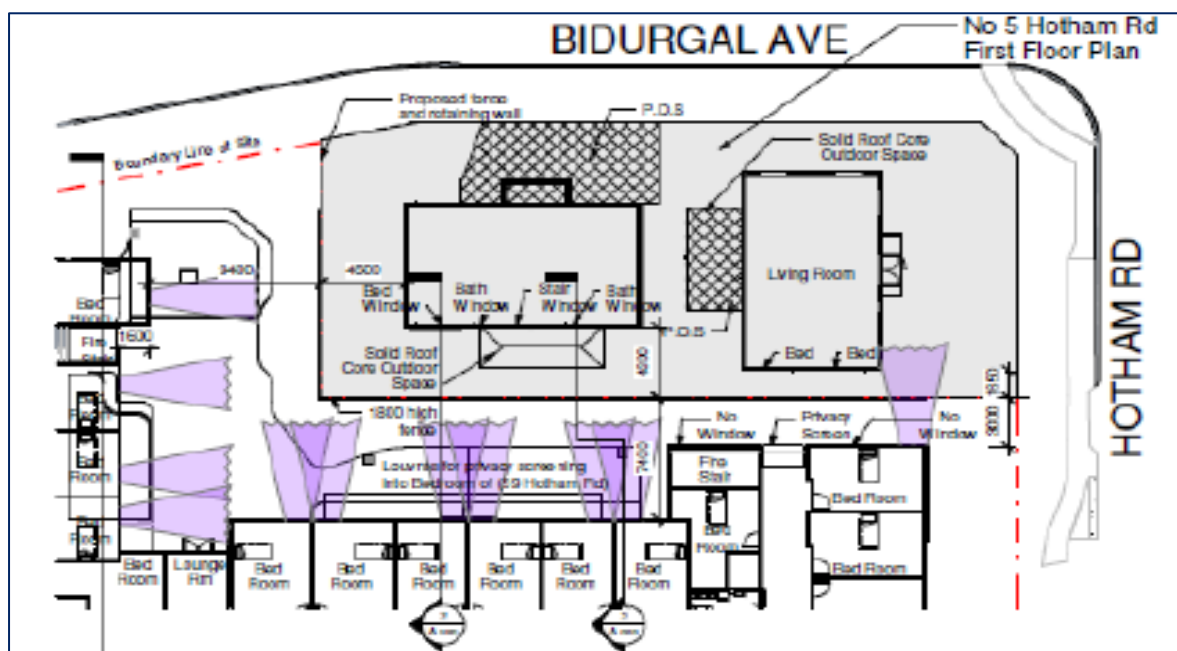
| Light spill diagram on 59 Hotham Road (Source: EIS, 2020)
